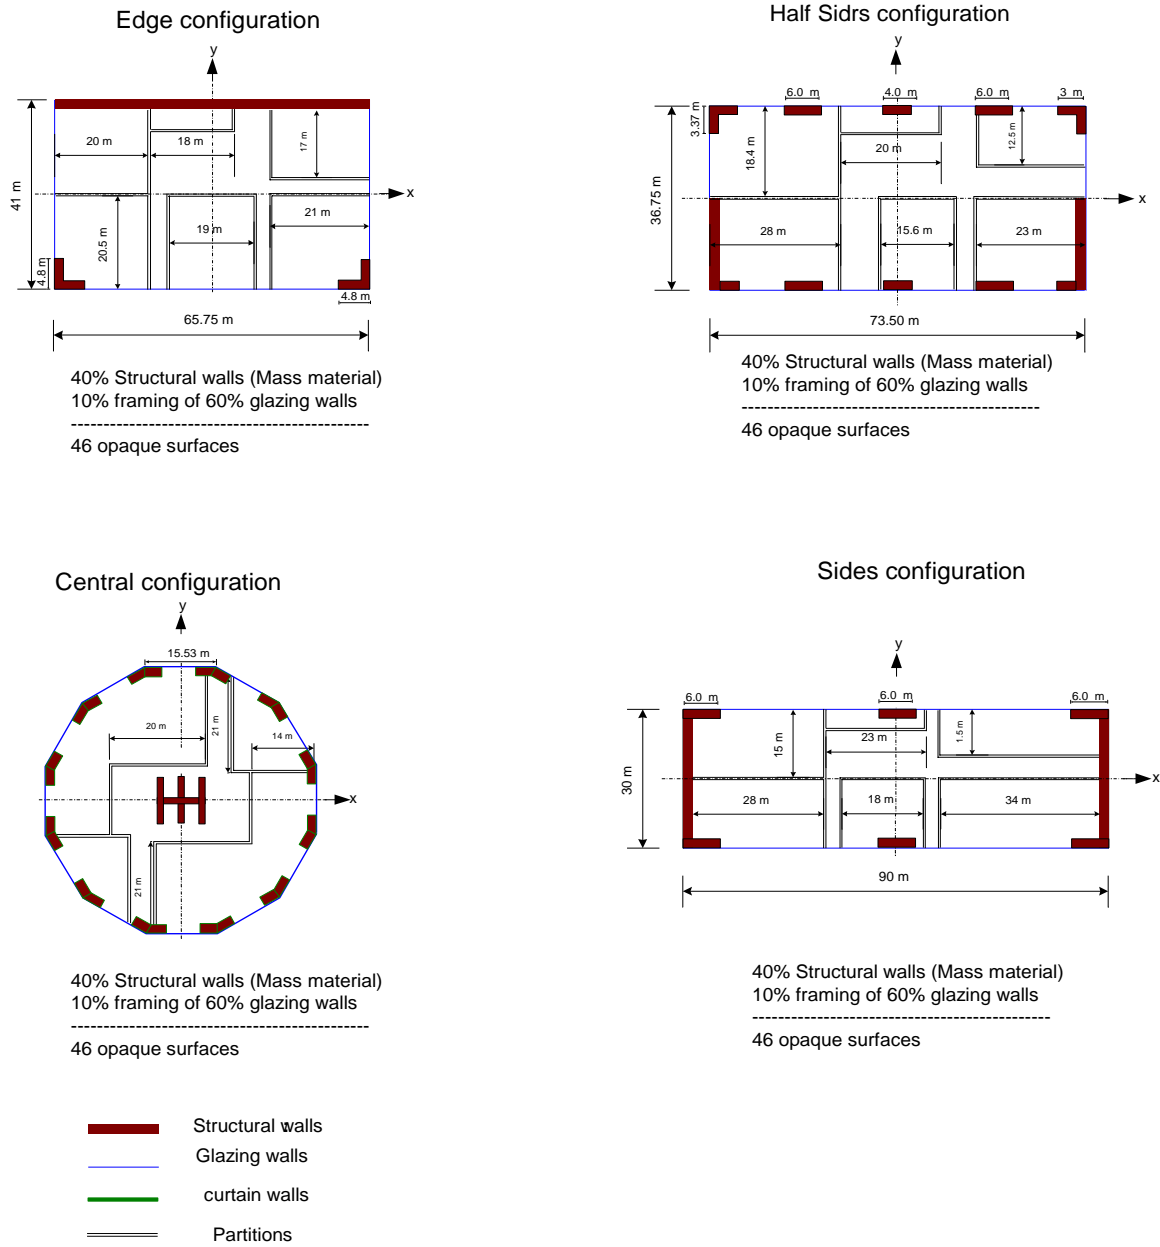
Plan views and an elevation of the buildings (EDO)
